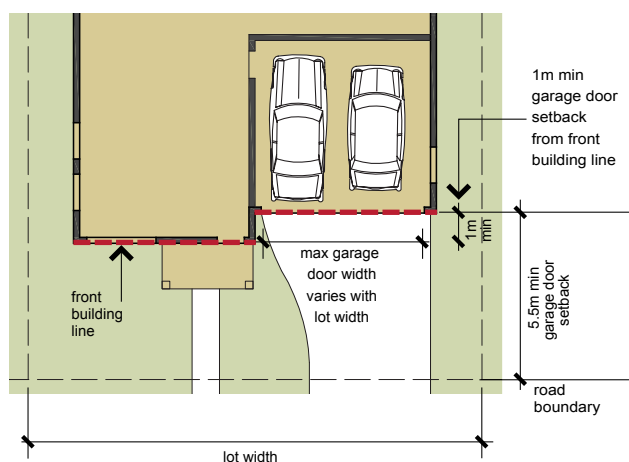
Minimum garage setbacks and maximum garage door sizes
